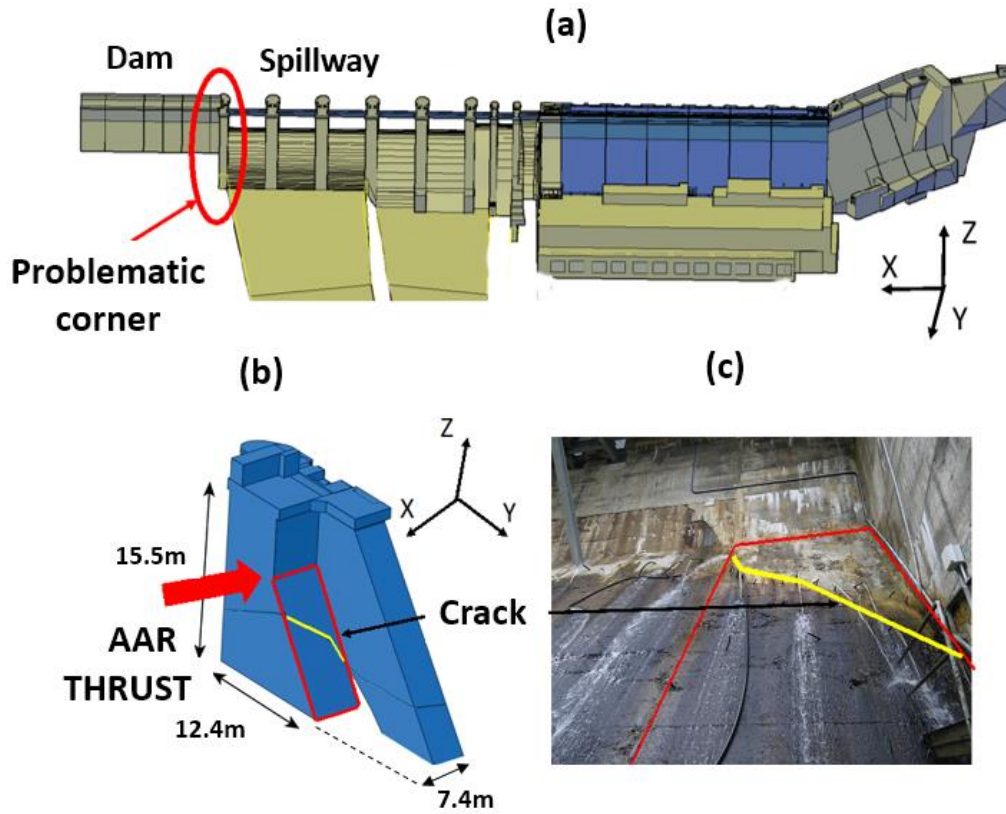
3D discrete cracking due to AAR expansion: (a) 3D view of hydraulic facility; (b) problematic corner showing 3D discrete cracking; (c) crack mapping on existing structure
